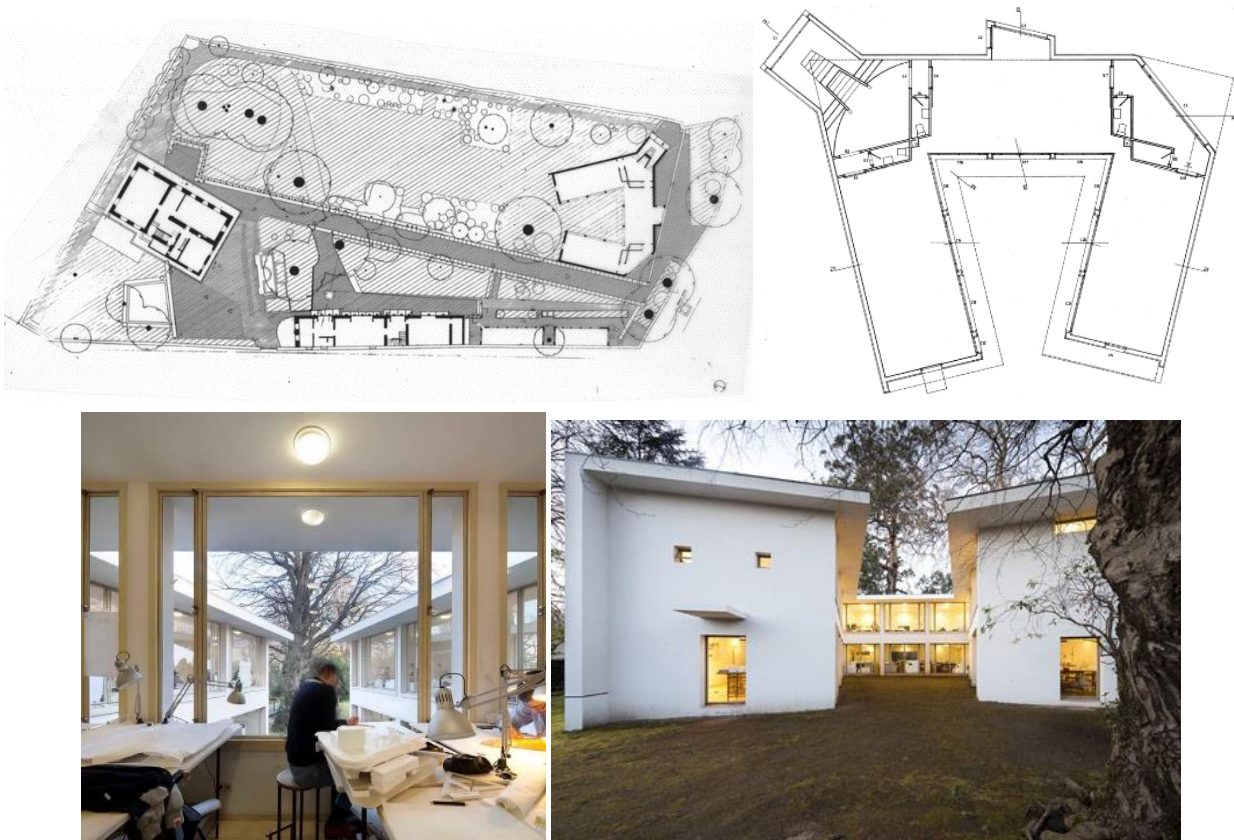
(i) top left: site plan and location of the pavilion (ii) top right: Plan and shape of the Carlos Ramos Pavilion (iii) bottom left: image showing the view from inside the studio (iv) bottom right: view of the pavilion building towards the courtyard. (Source: <https://www.alvarosizavieira.com/1995-faculty-of-architecture/>).
